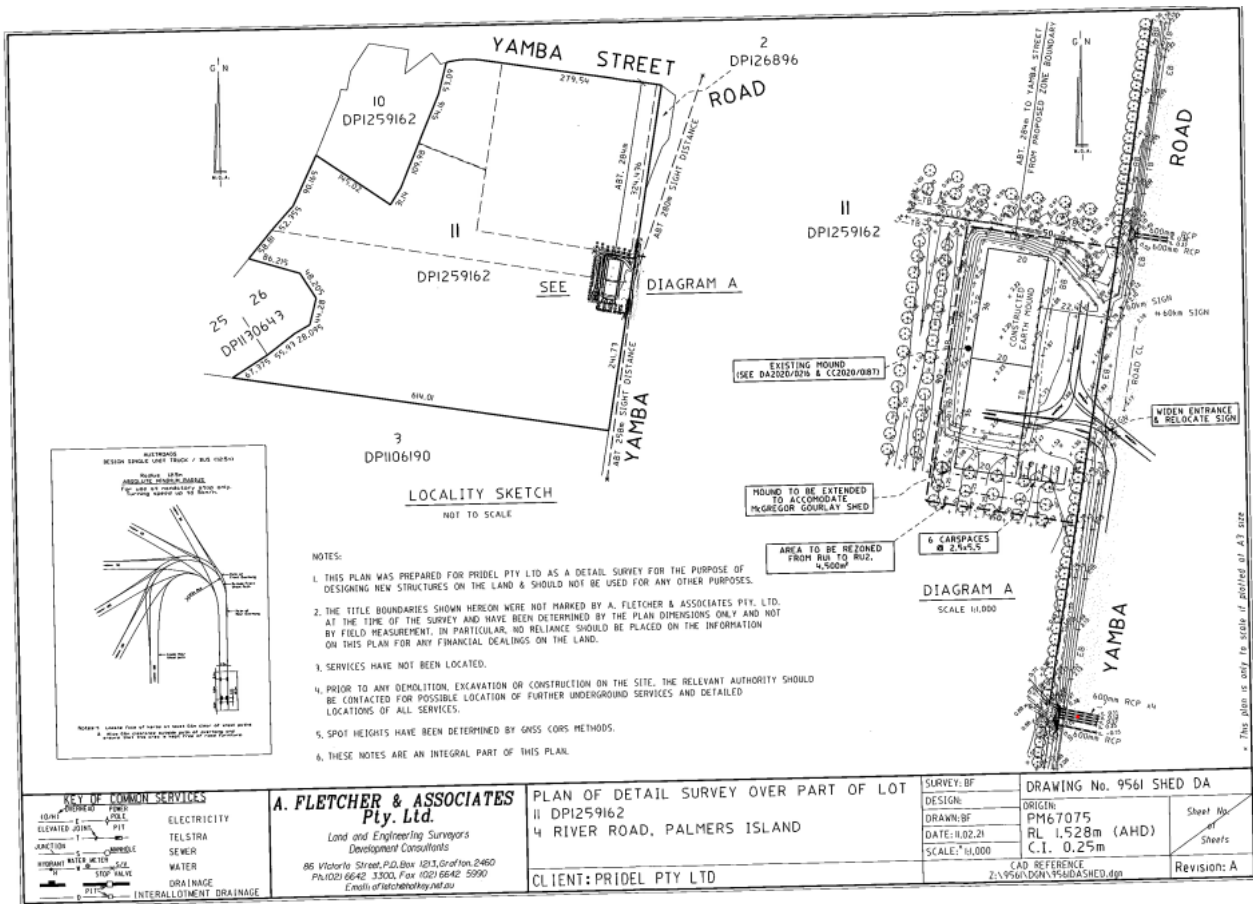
Indicative Site Design for Proposed Rural Supplies Store
